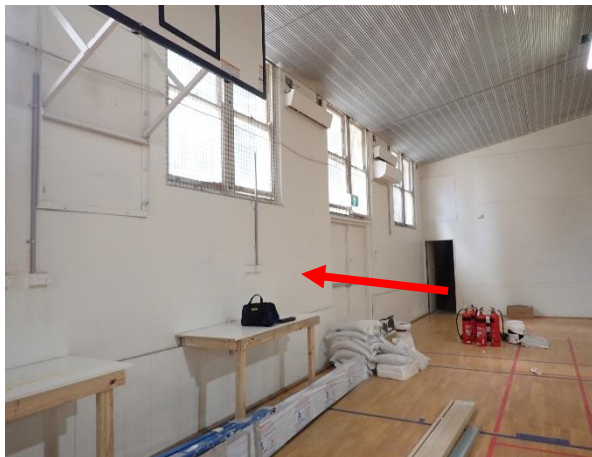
PCYC – lead based white paint to the internal cement rendered masonry walls
